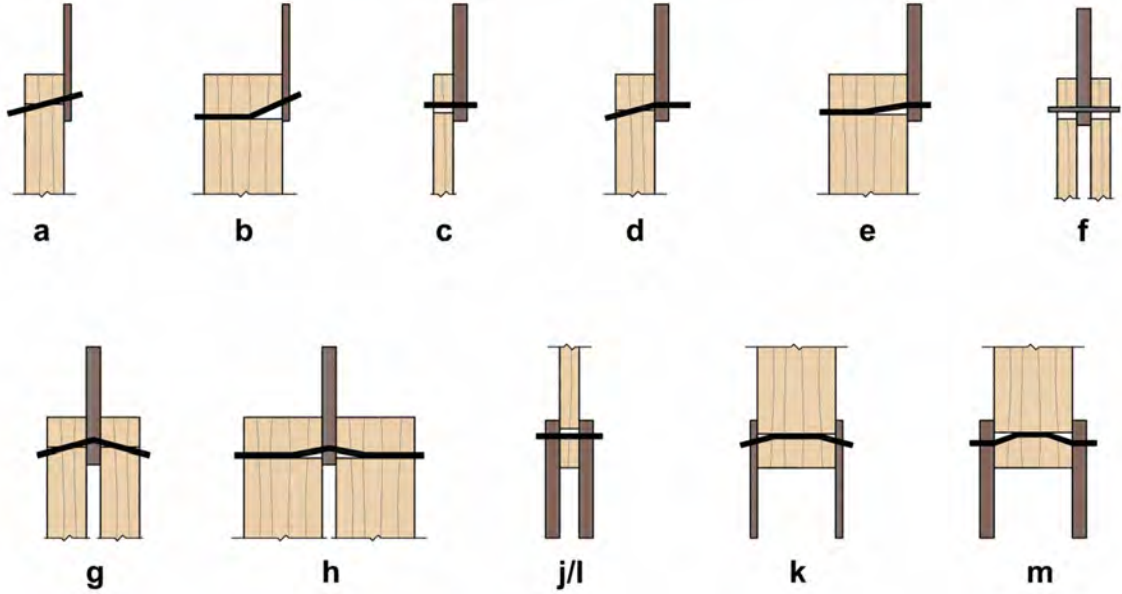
Basic failure modes of fasteners for steel-to-wood dowel type connection.
